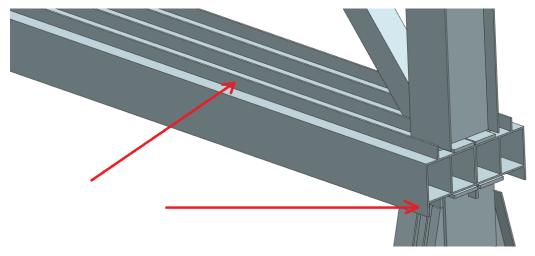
Walkaway fixing proposal: Bottom Beams' flanges
